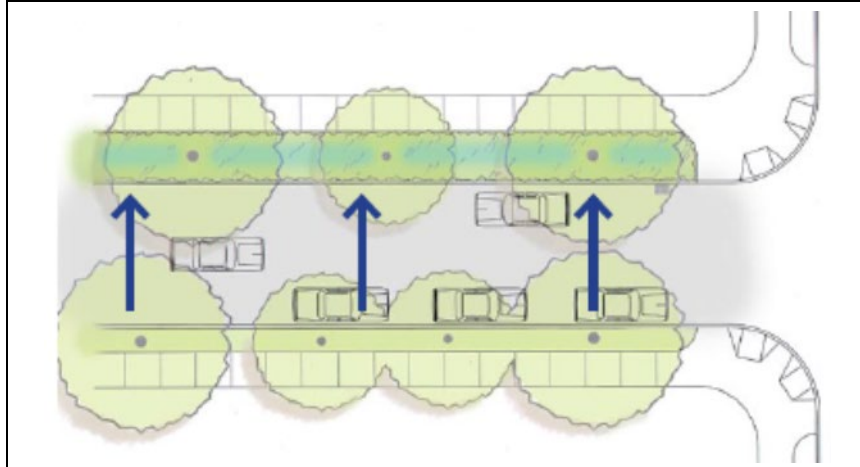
Side Shed Street Profile. Side shed streets are designed to shed all water to one side of the street. GI facilities would be located on the downslope side.
